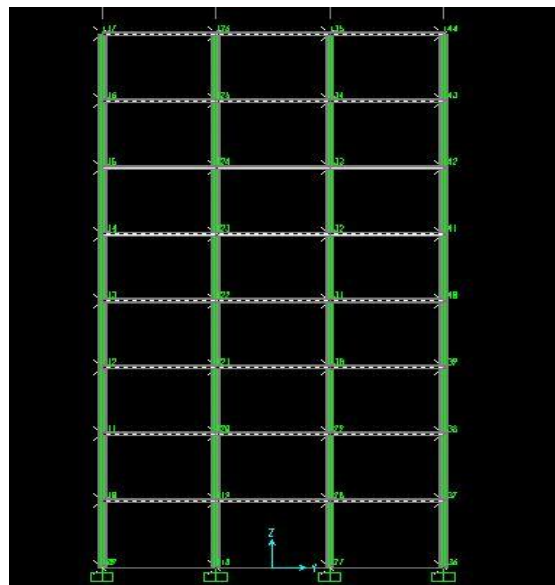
c 2-D(y-z plane) model of the frame structure
